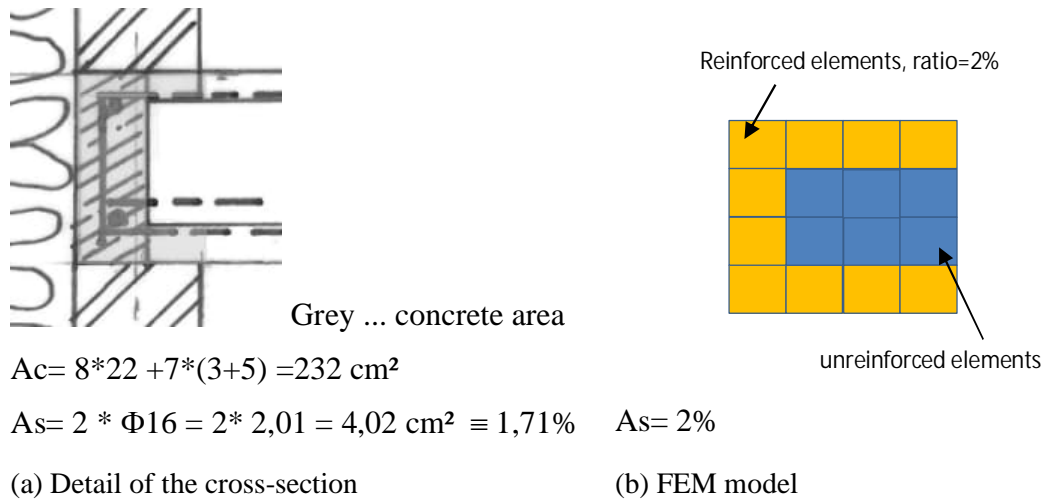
Finite element discretization of the slab cross-section together with the ring beam
